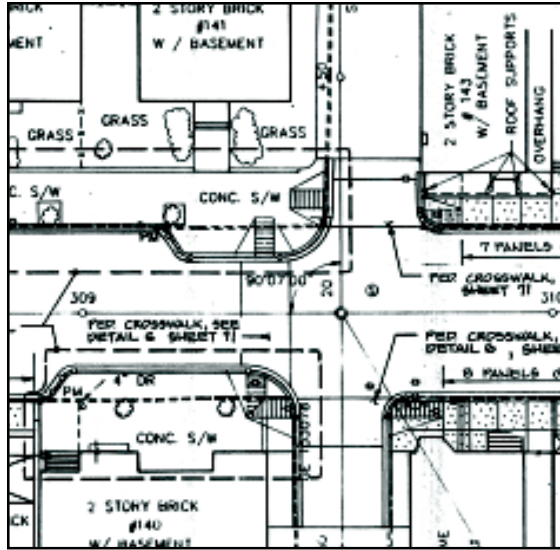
Narrowed intersection (note detail of surrounding built form).
